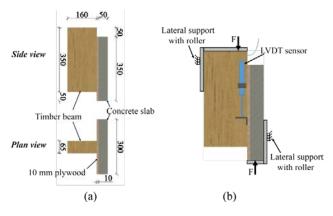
(a) Test Specimen Dimension; (b) Test Setup
